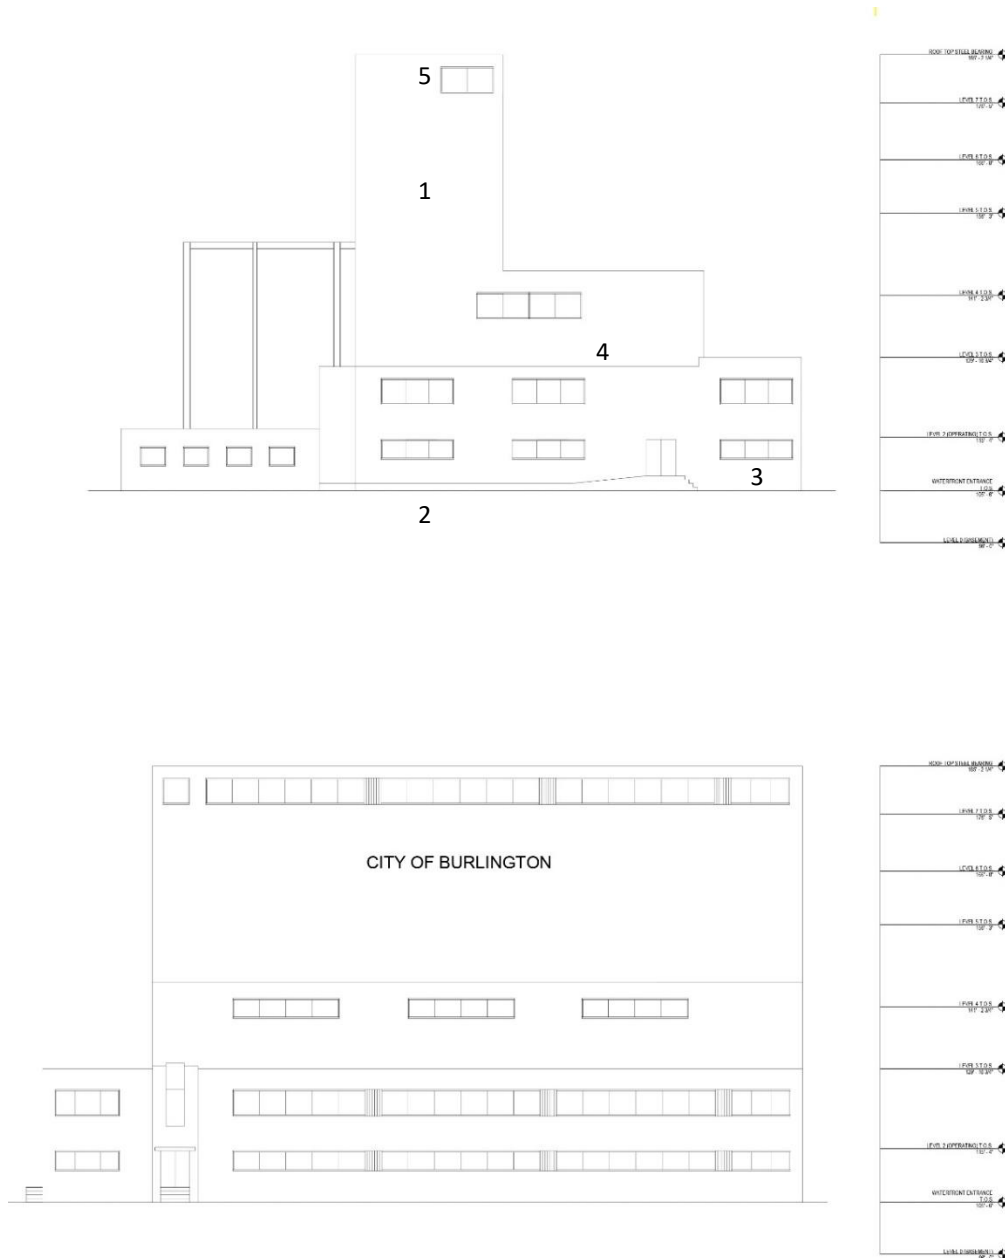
EXISTING ELEVATIONS. WEST ELEVATION (TOP), SOUTH ELEVATION (BOTTOM). NUMBERS CORRESPOND TO PICTURES IN FIGURE 56
